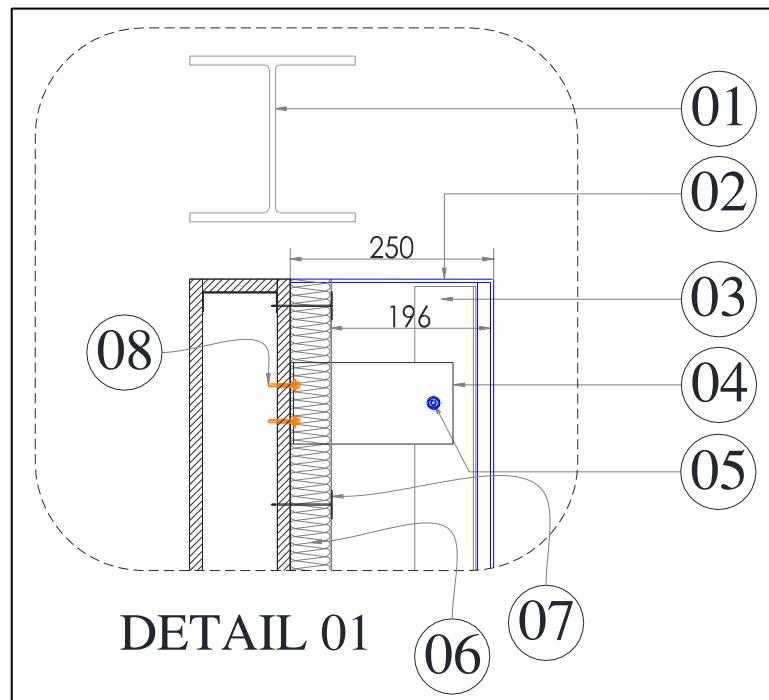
Vertical sectional view of the cladding system at window width and intermediate width. (Drawing provided by the test sponsor).
